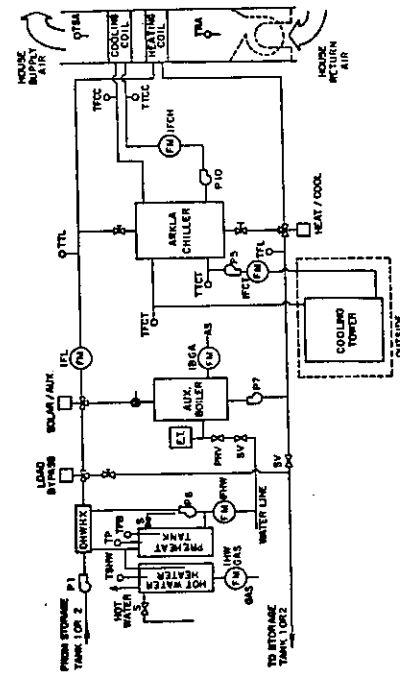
Solar House I Equipment and Piping Diagram, House Load System, May 1978 to October 1978
